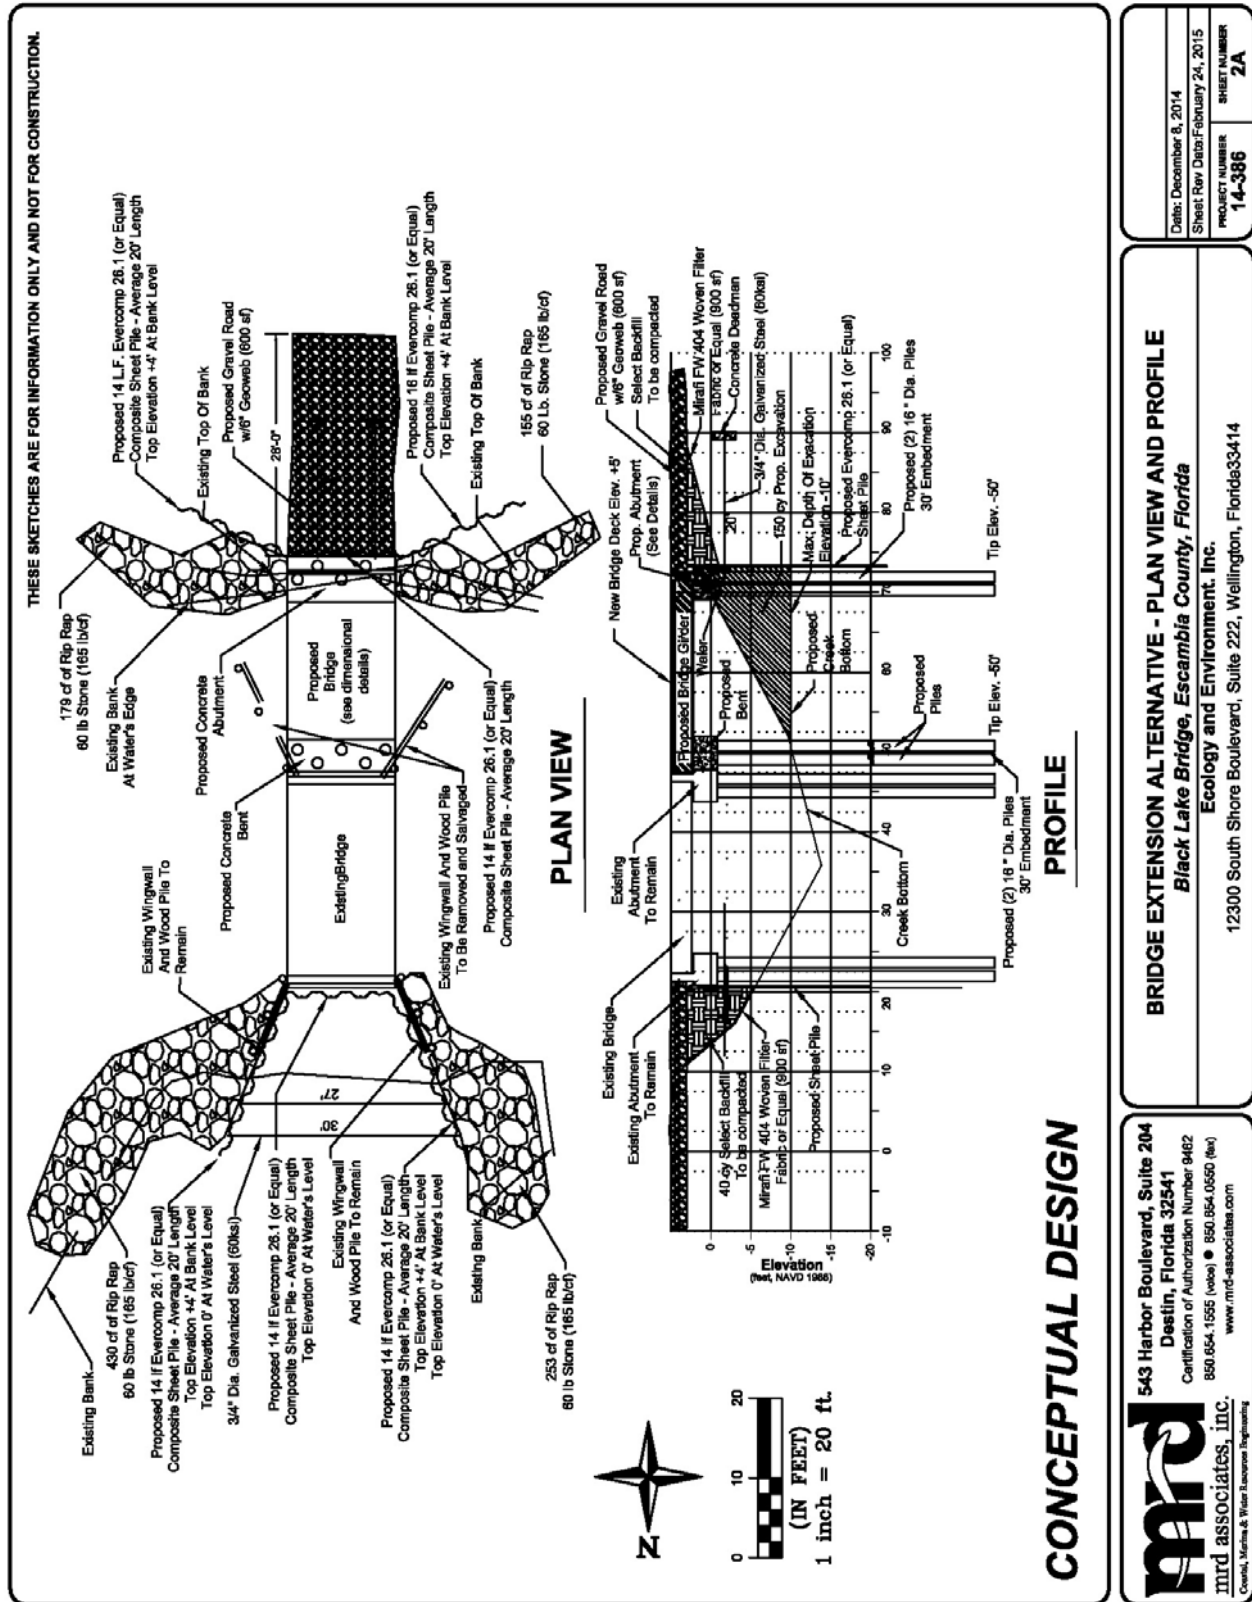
Alternative B – Extend bridge and protect abutment plan and profile view.
